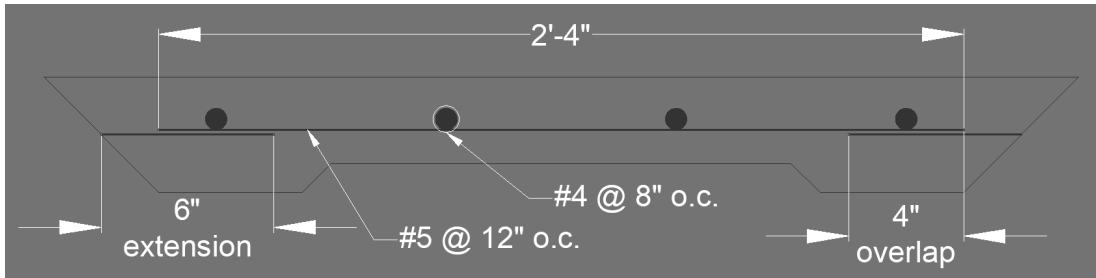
C-C' elevation of specimen design from Figure 3-3
